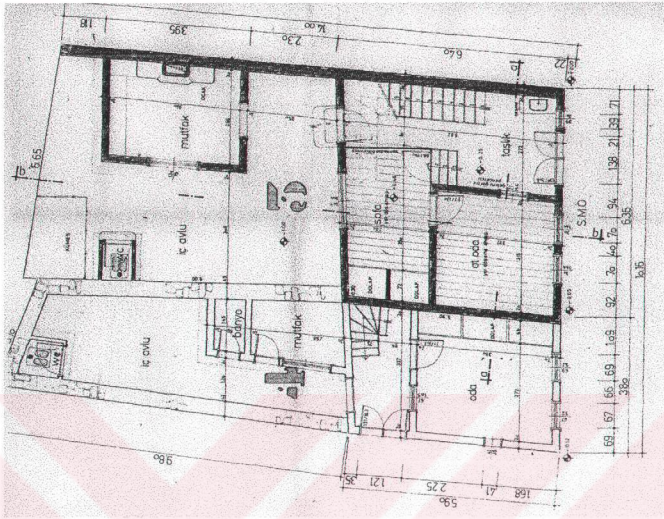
Yurt Street, No: 13, Ground Floor Plan
